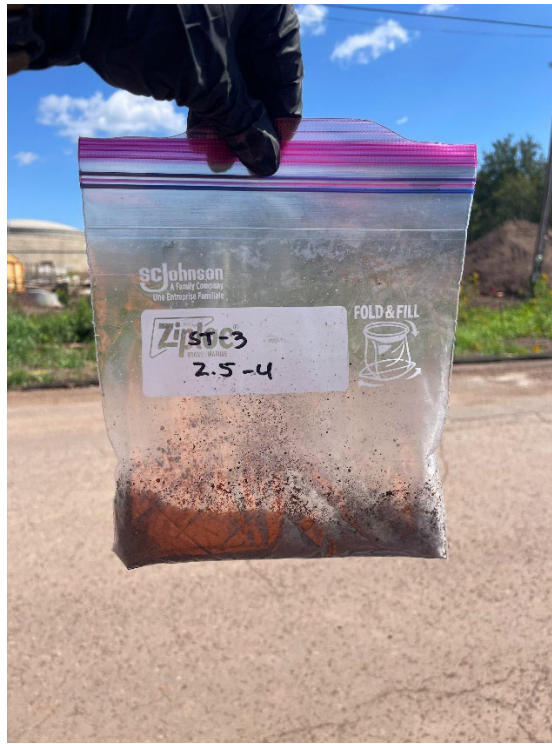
Lighthouse Point Road Reconstruction – Environmental Screening	B2406524
